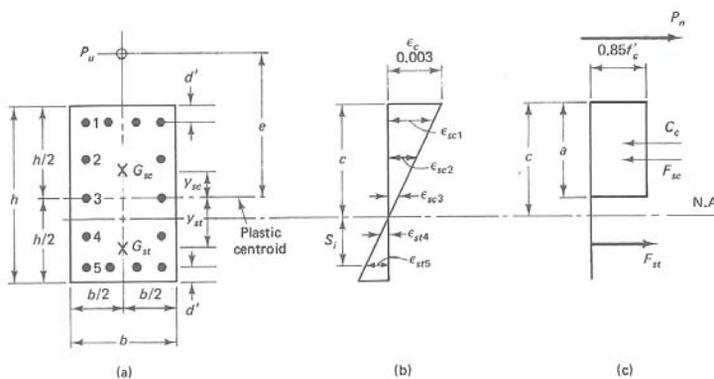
Column Reinforced with Steel on all Faces: (a) Cross-Section; (b) Strain; (c) Forces
